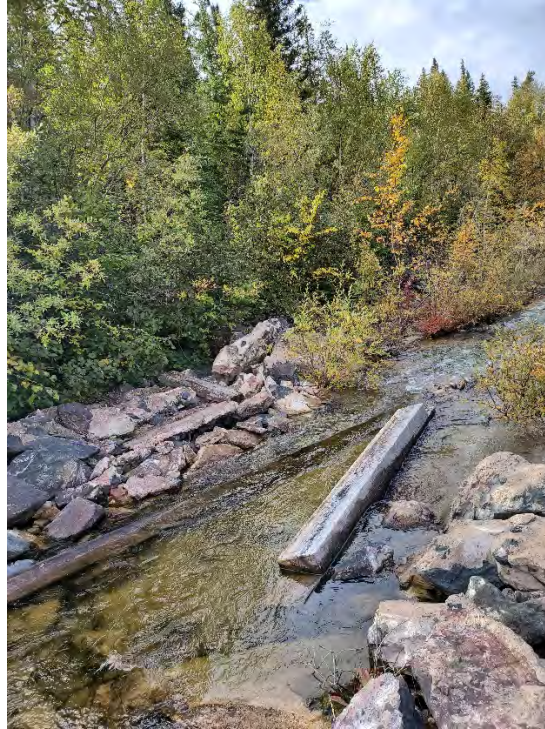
Close-up view of the ice-jacked slabs of grout-intruded rip-rap on the left side of the spillway, facing downstream. Photo taken on September 16, 2020.
